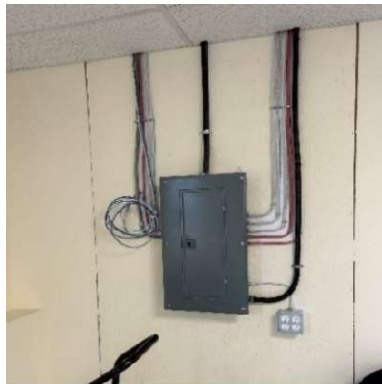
Electrical Box (100 Amp) in New Building Addition
